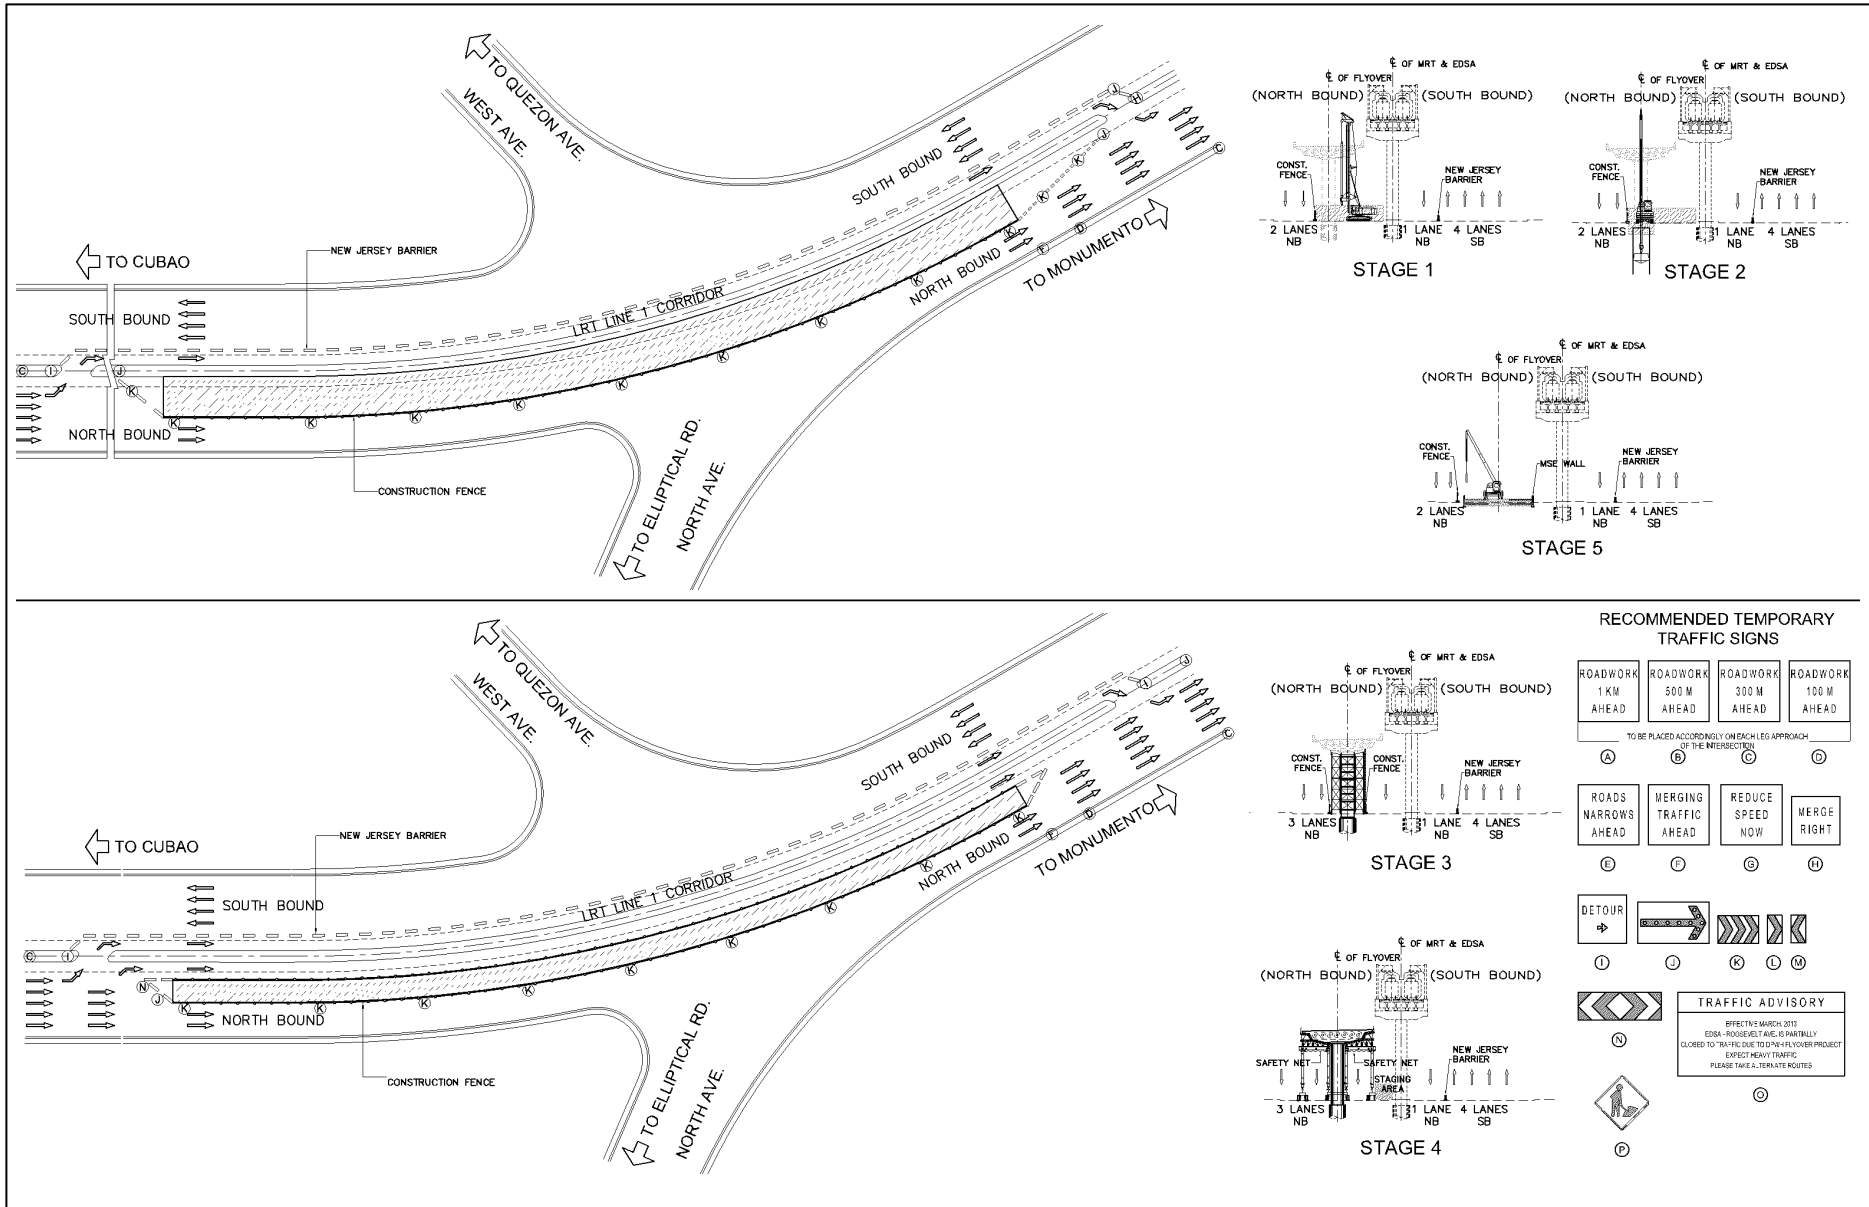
Construction Plan for EDSA/North/West Interchange (2/2)
